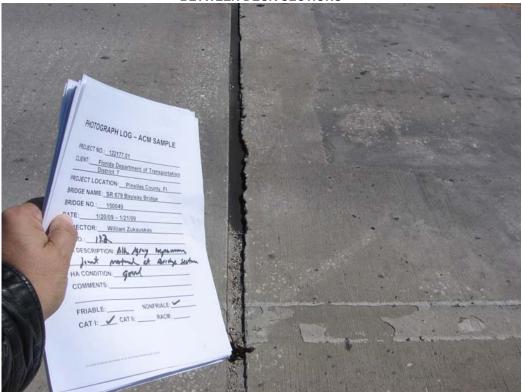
01/21/09 - SAMPLE 13.2 - HA 13 BLACK AND GRAY EXPANSION JOINT MATERIAL BETWEEN DECK SECTIONS
